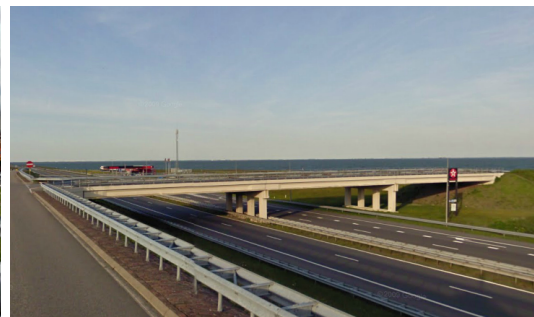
7 and 49 Bridge Breezanddijk and gas station sign
